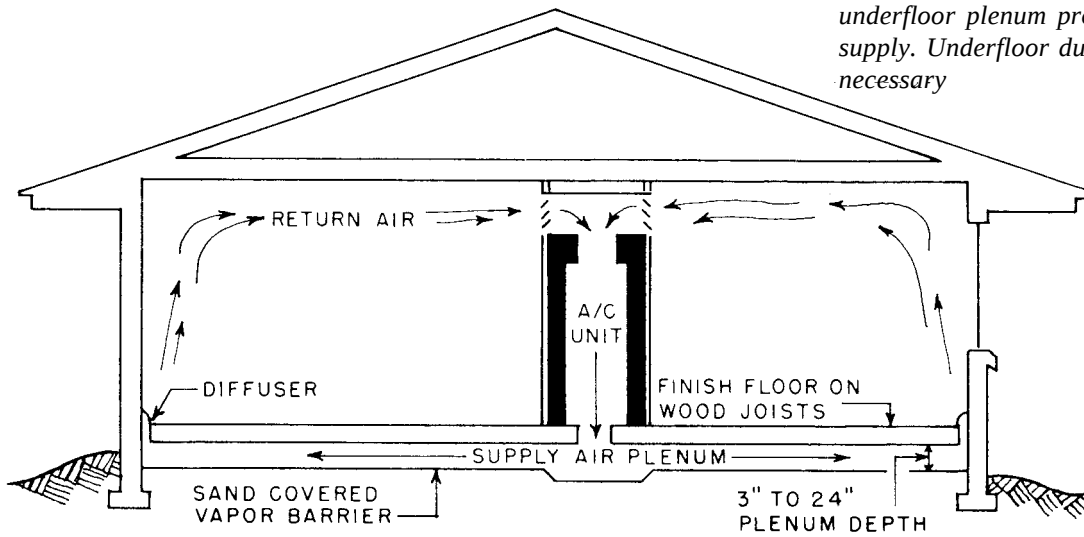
Wood floor construction has been designed for use in combination with an underfloor plenum.
